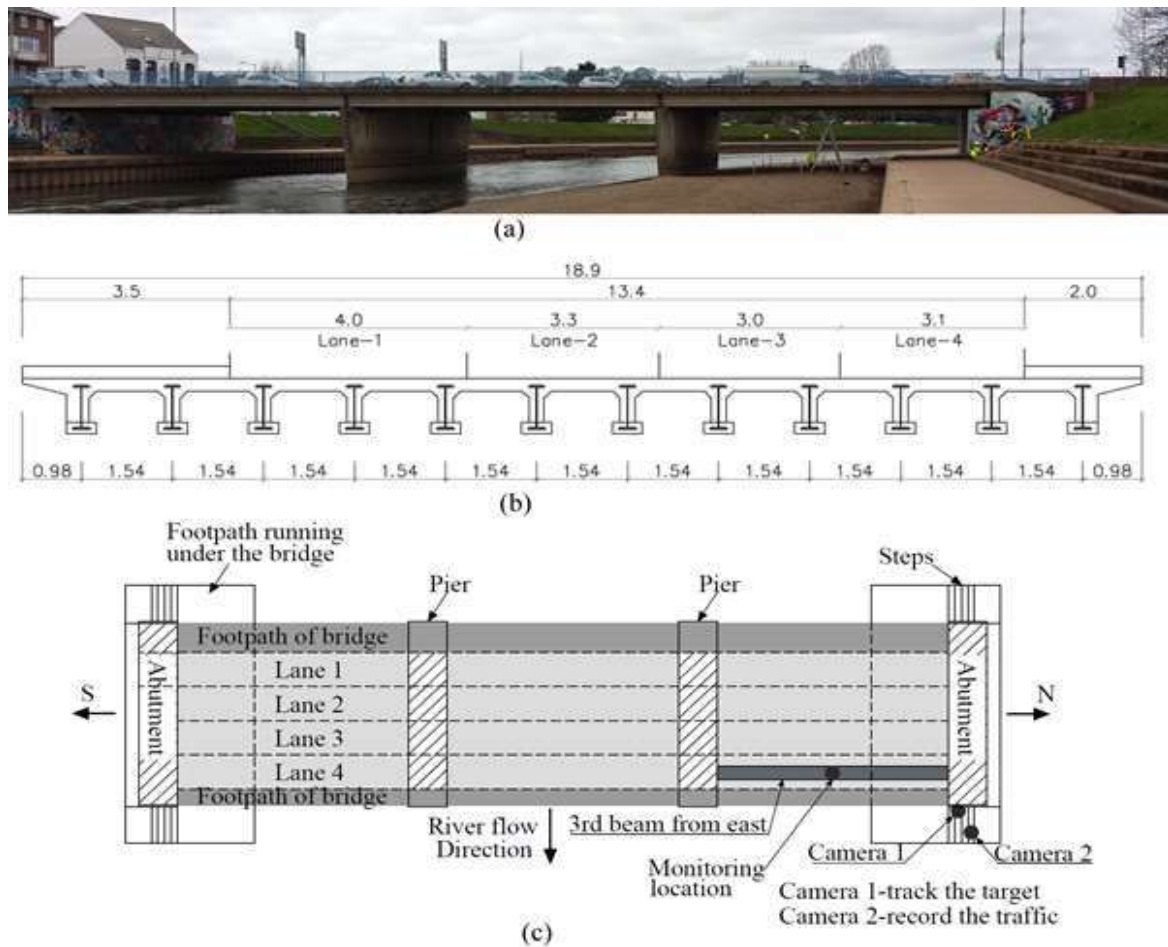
Bridge used in load test (a) East elevation showing 3-spans of the bridge, (b) typical section of the bridge deck, (c) Annotated plan view of bridge deck highlighting monitoring location.
